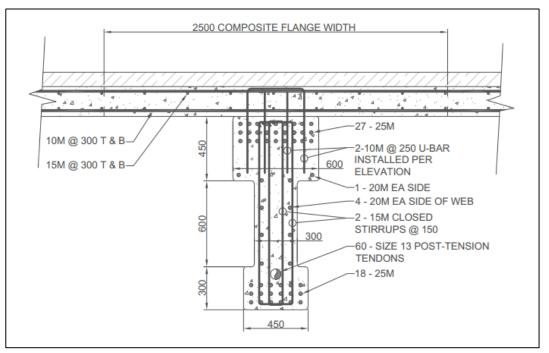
Precast Concrete I-beam Preliminary Design Section (Alloy Consulting Ltd., 2015)
